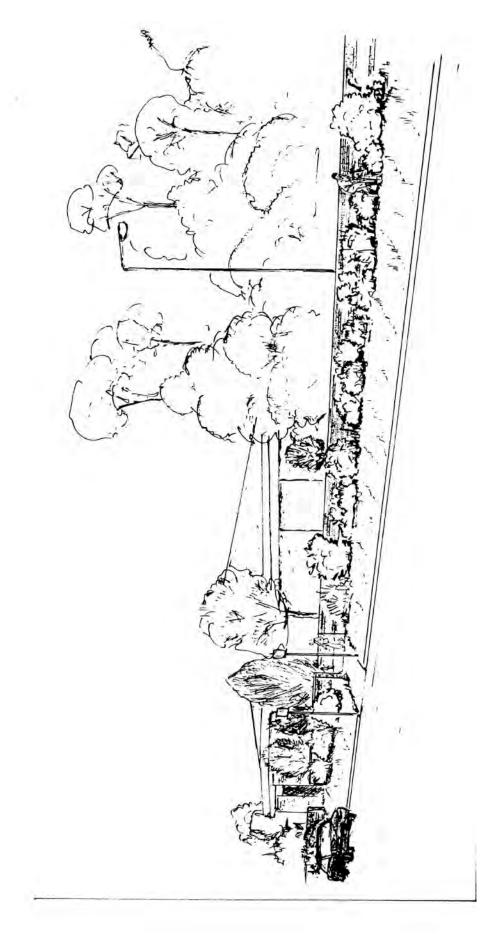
MASONRY FLOODWALL WITH SCREEN PLANTING
